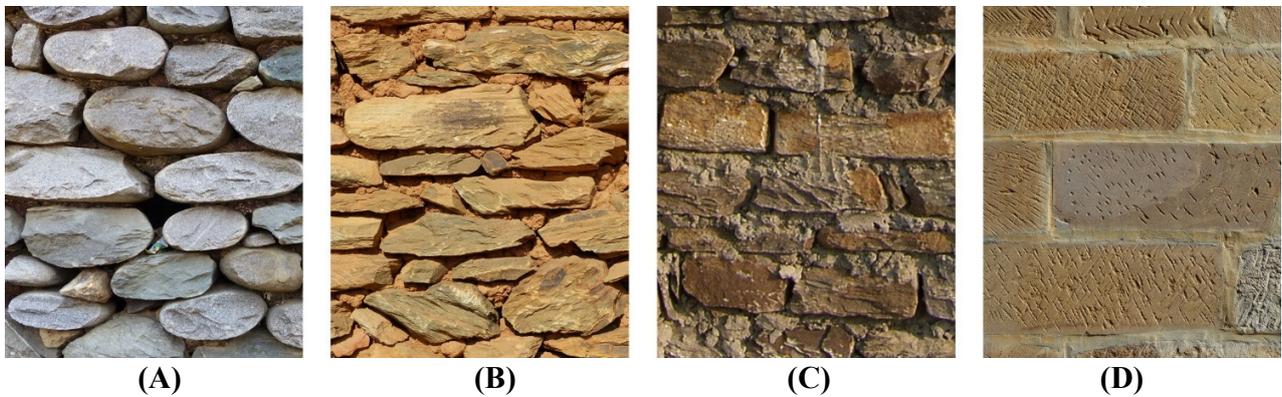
(A) Round river boulders with mud mortar. (B) Random rubble stone masonry with mud mortar. (C) Random rubble stone masonry brought to courses with cement mortar. (D) Ashlar stone masonry with lime-sand mortar (all by courtesy of Smart Shelter Foundation).
